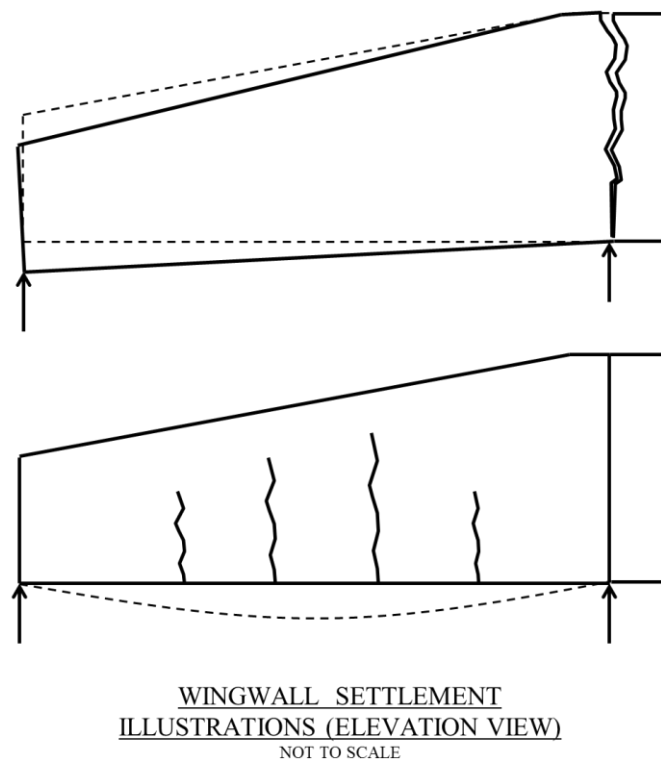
Wingwall Foundation Settlement Cracking Illustrations
